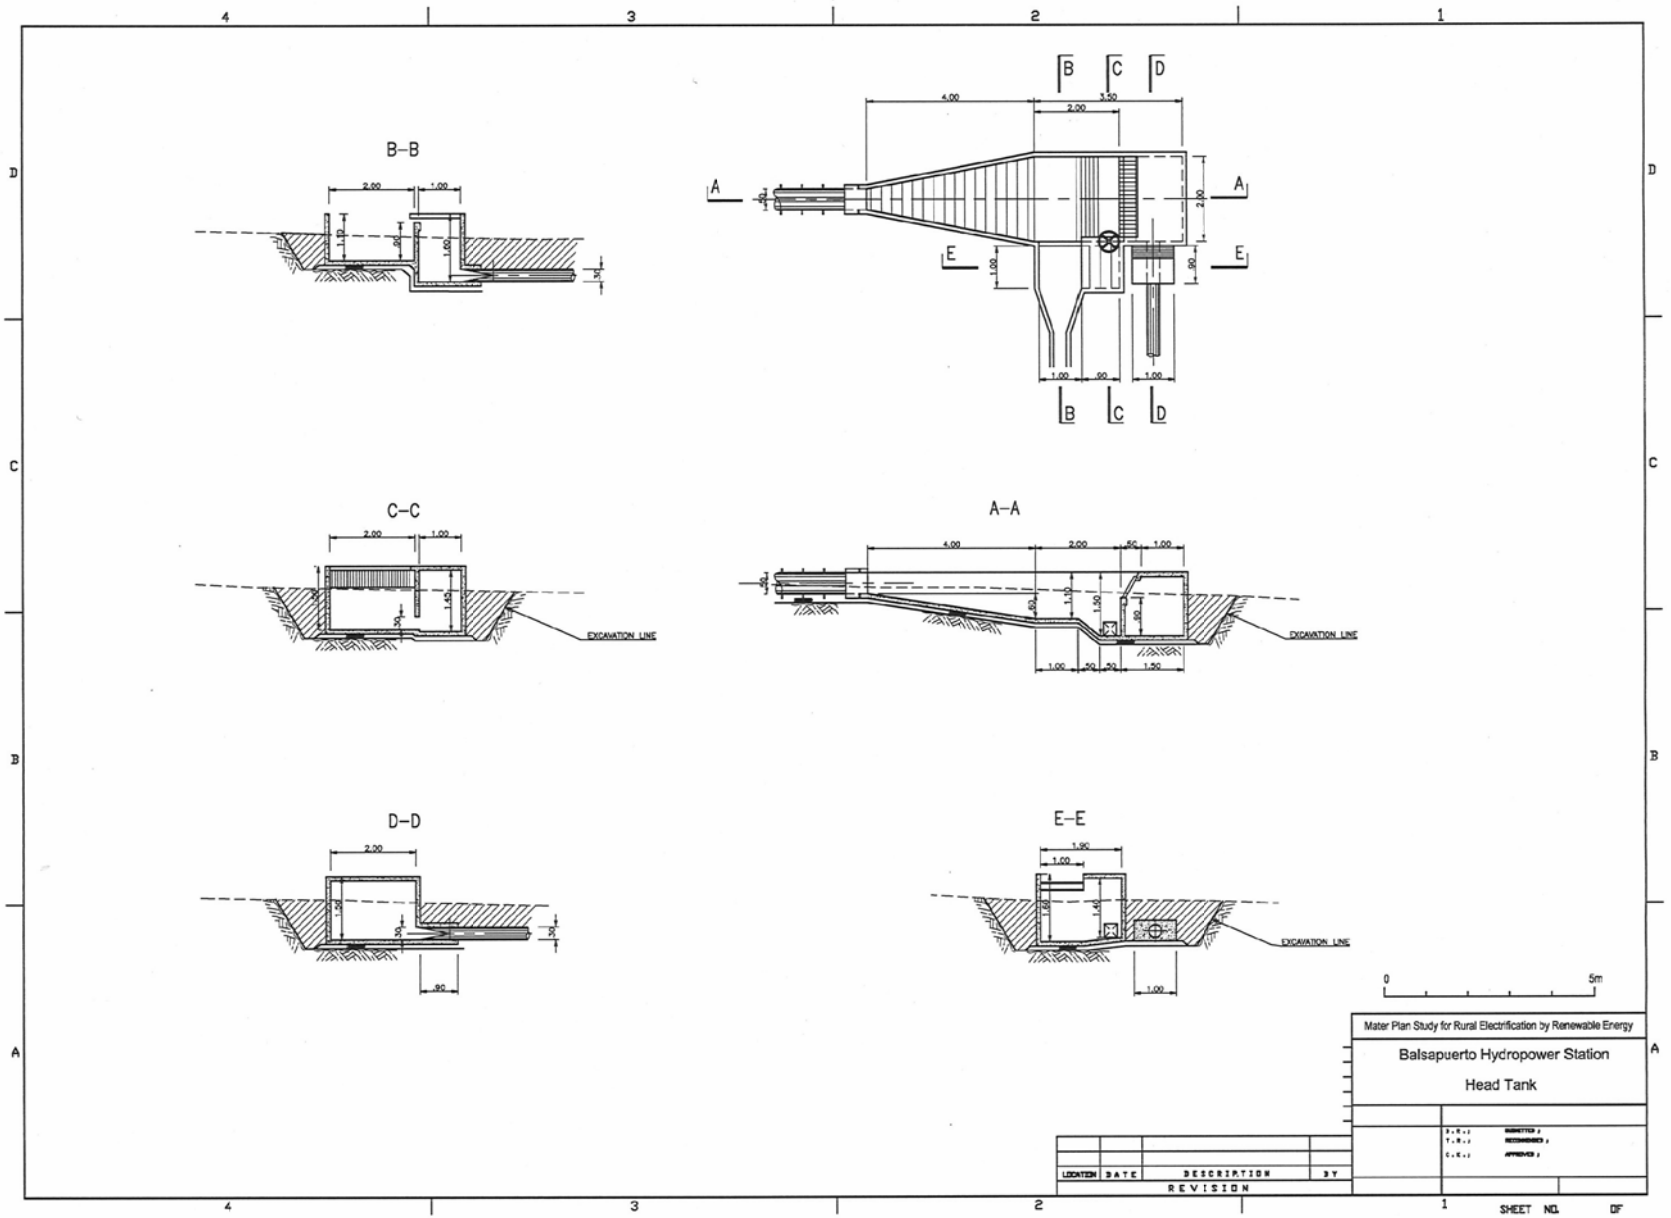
Rough Design Drawings of Head Tank
